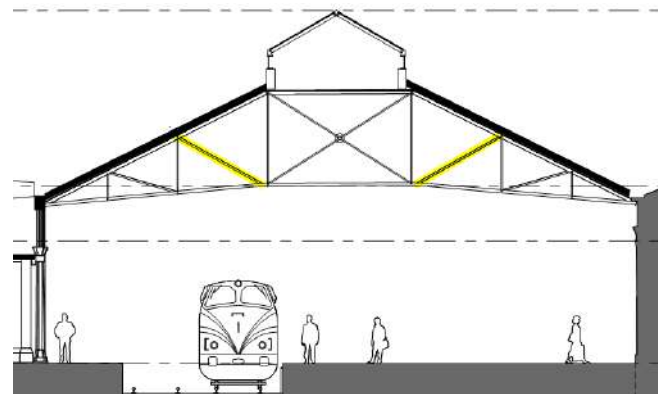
Strengthening detail to diagonal elements
